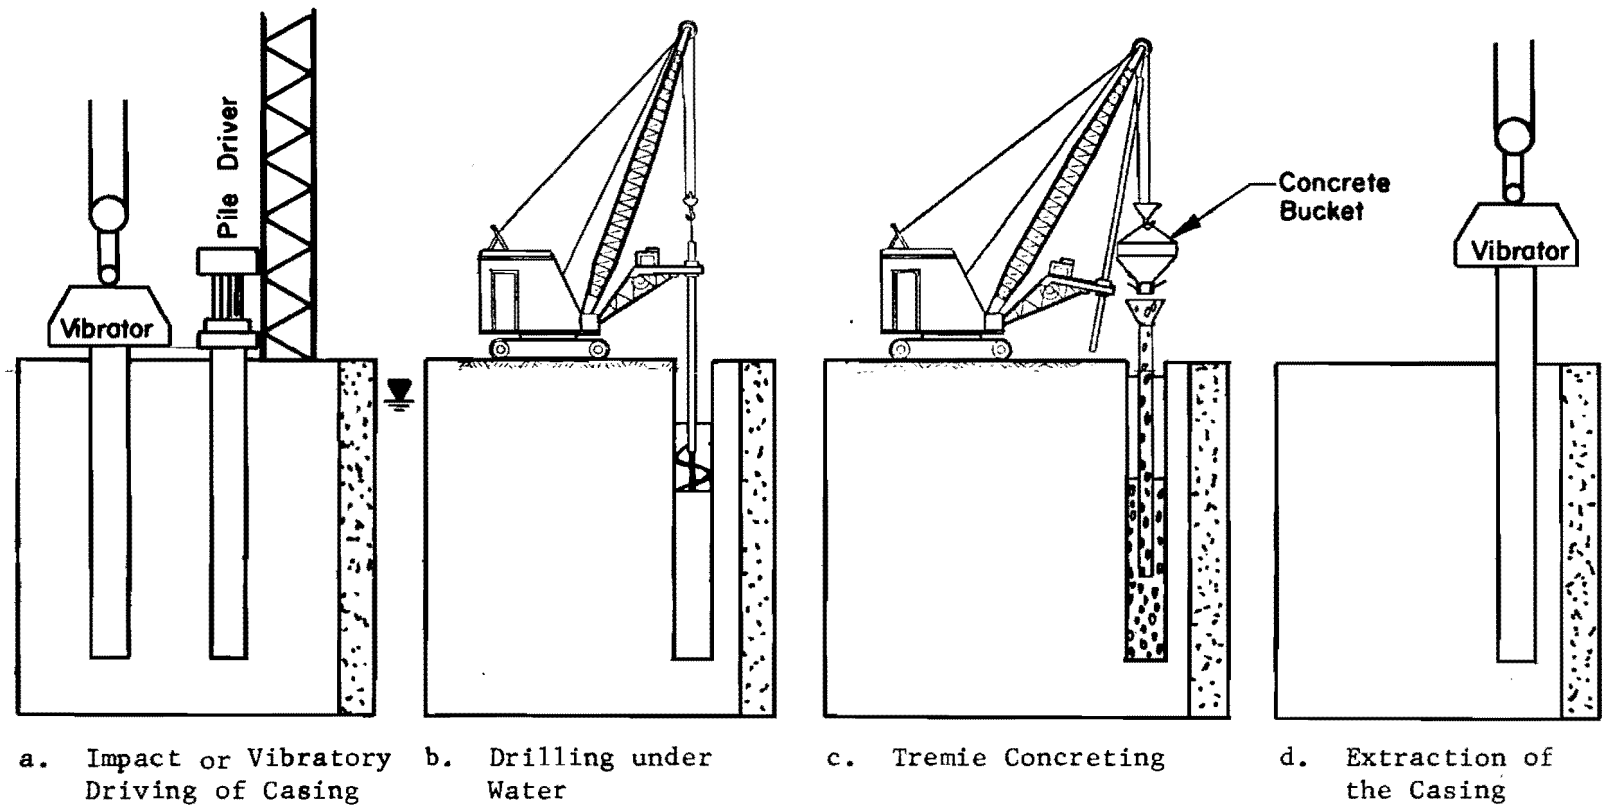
Wet Drilling and Concreting, with Preinstalled Casing
